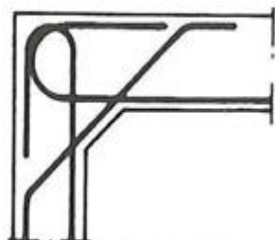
Corner joint with stirrups (Nilsson, 1973)
